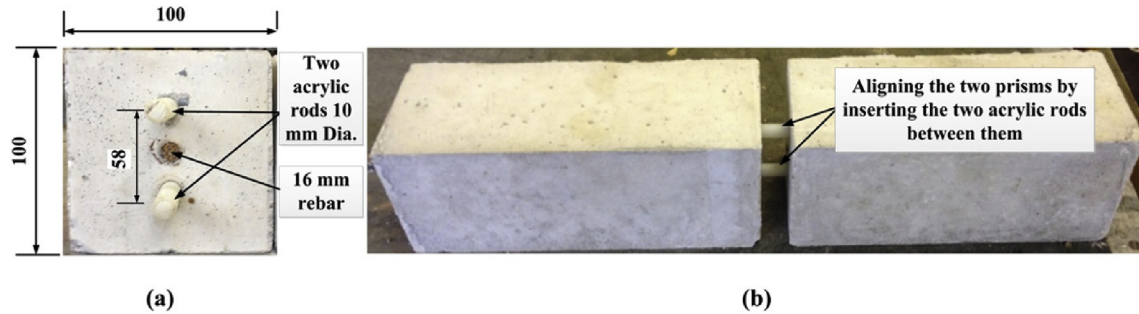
Alignment of the two concrete prisms using two acrylic rods (Dimensions in mm).
